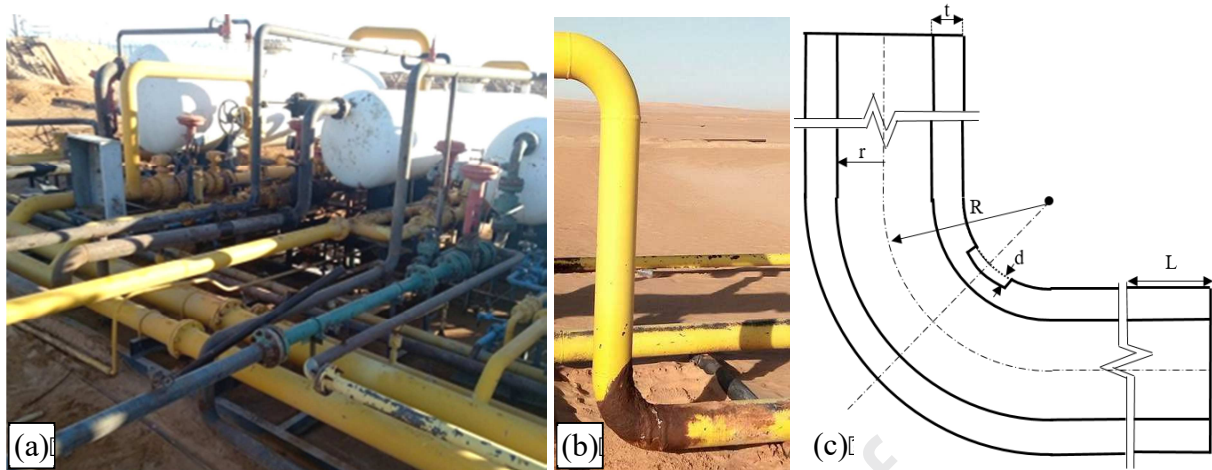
API X52 pipeline elbow: (a) manifold separation system; (b) corroded pipe elbow; (c) pipe elbow dimensions.
